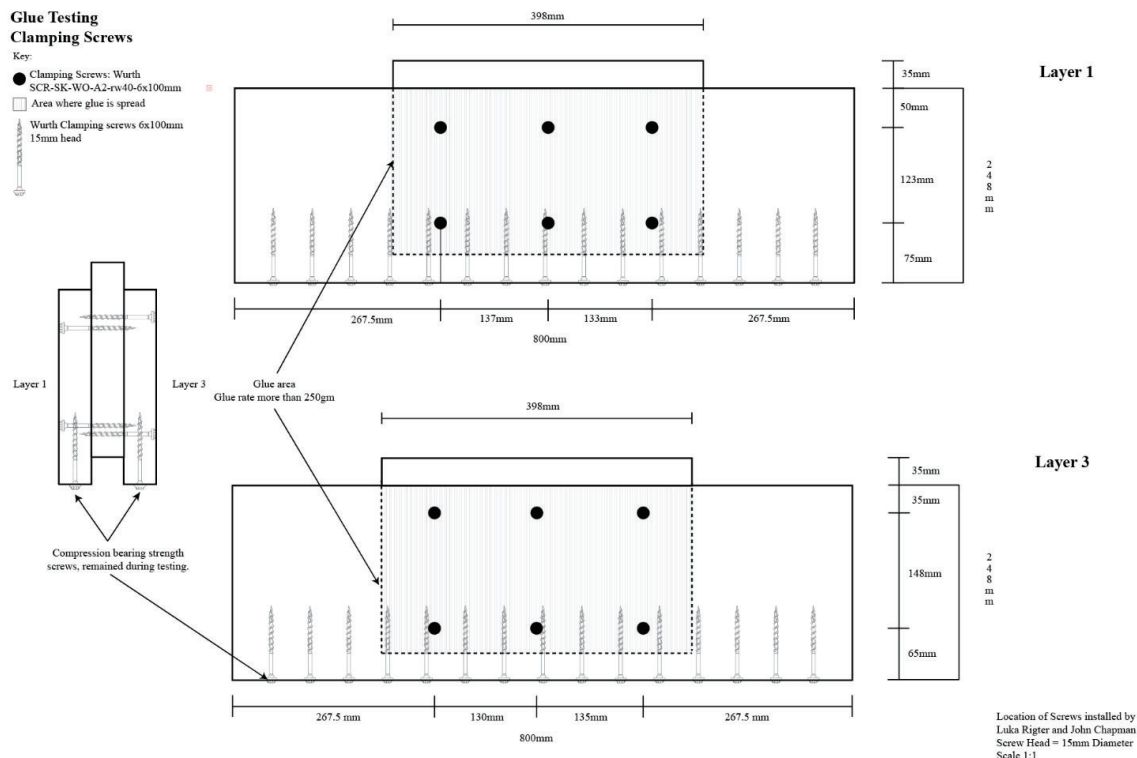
Glue Testing with Clamping screw setup for sample tests.
